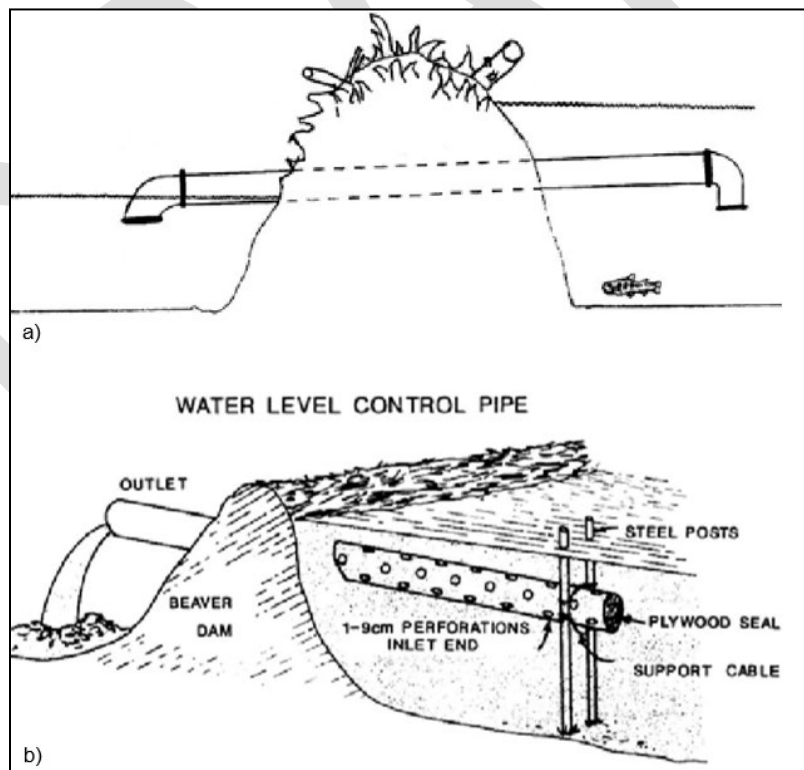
Examples of pond levelling structures: a) beaver siphon and b) perforated culvert. Constructed ditch factsheet. 2005. Drainage Management Guide – No. 16. British Columbia Ministry of Agriculture, Food and Fisheries. p.2.
